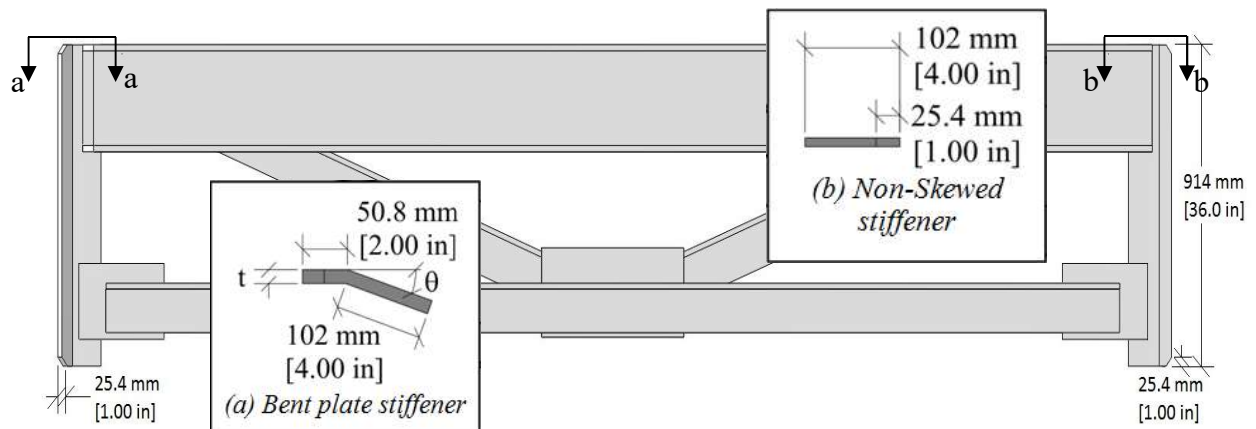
Abutment diaphragm and connection stiffener geometry
